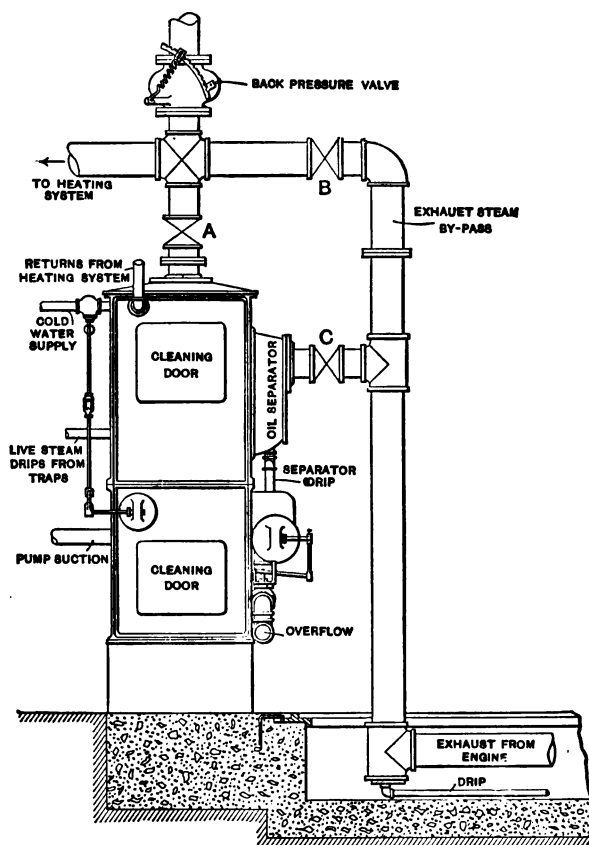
Typical Arrangement of an Open Heater and Connections
